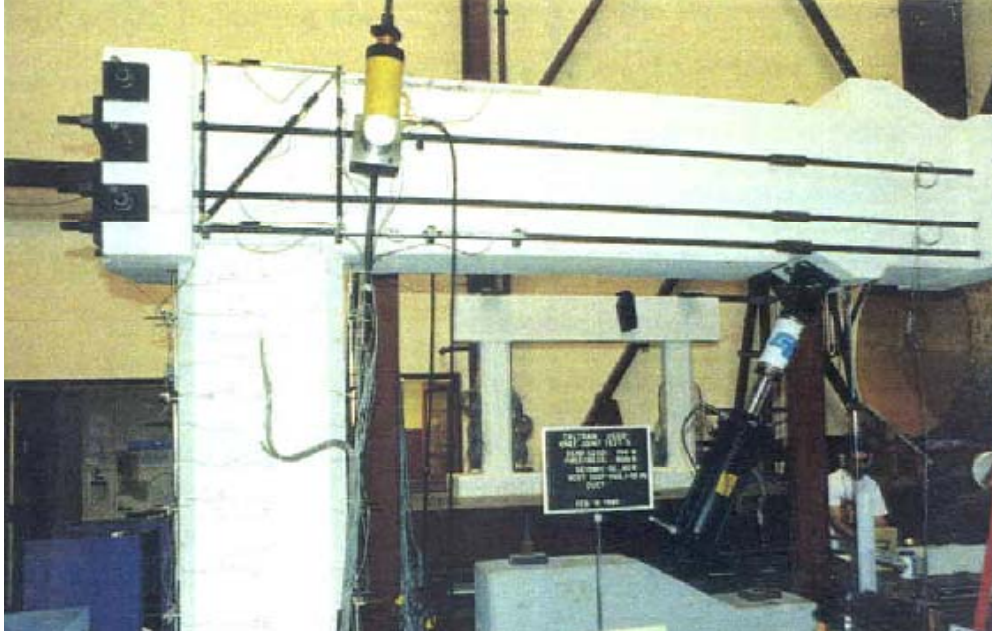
Retrofitted Technique Using External Prestressing (Adapted from Ingham et al., 1994a)
